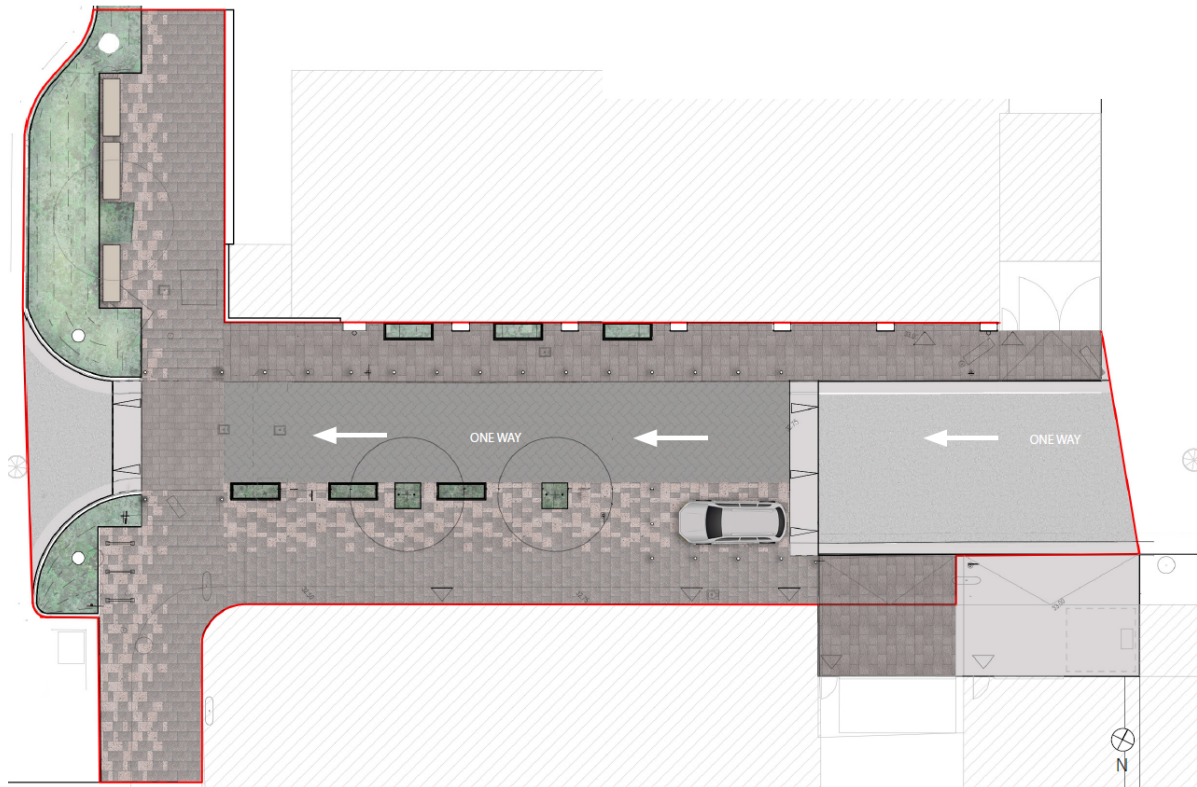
Bligh Street Shared Zone Option 2 – Brick travel lane
